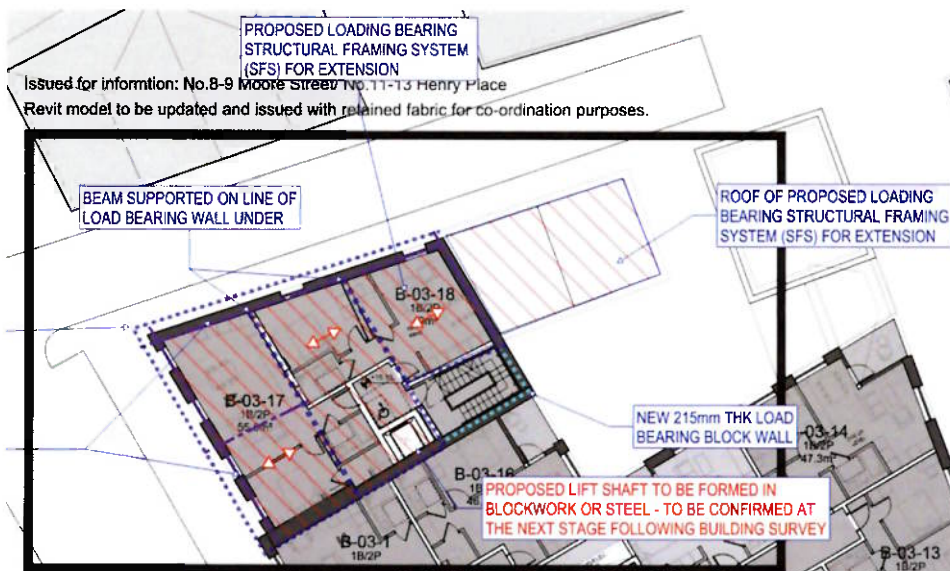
Steel at 3rd Floor to Support Extension Over 8-9 Moore Street.
